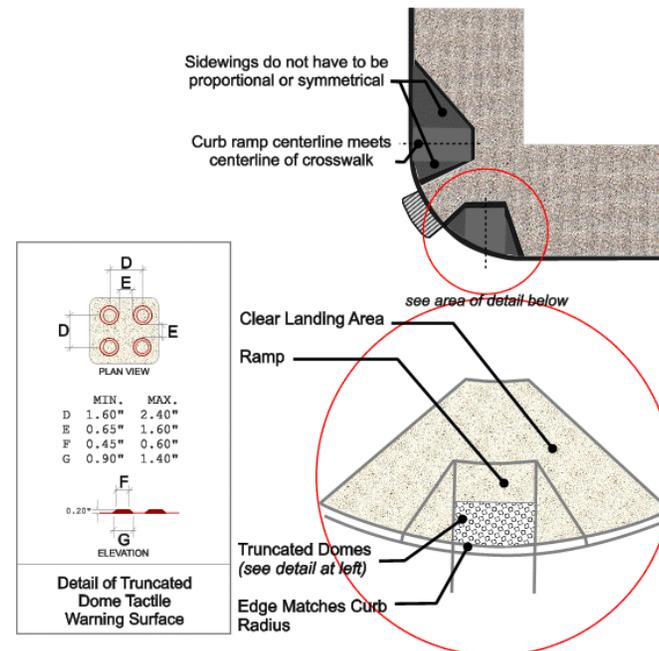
Detail of an ADA-compliant curb ramp design with truncated dome measurements.
